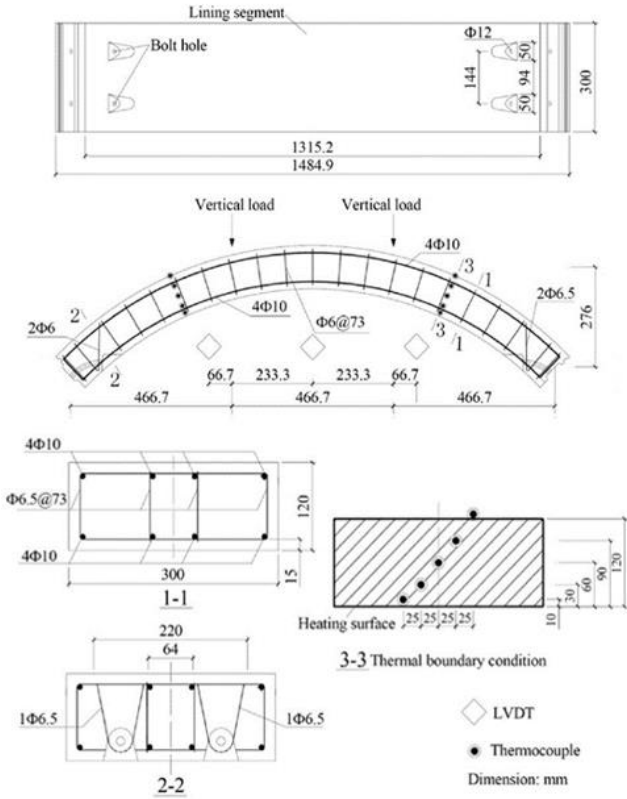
The geometrical dimensions and rebar details of the RC tunnel segment (Yan et al., 2015)
